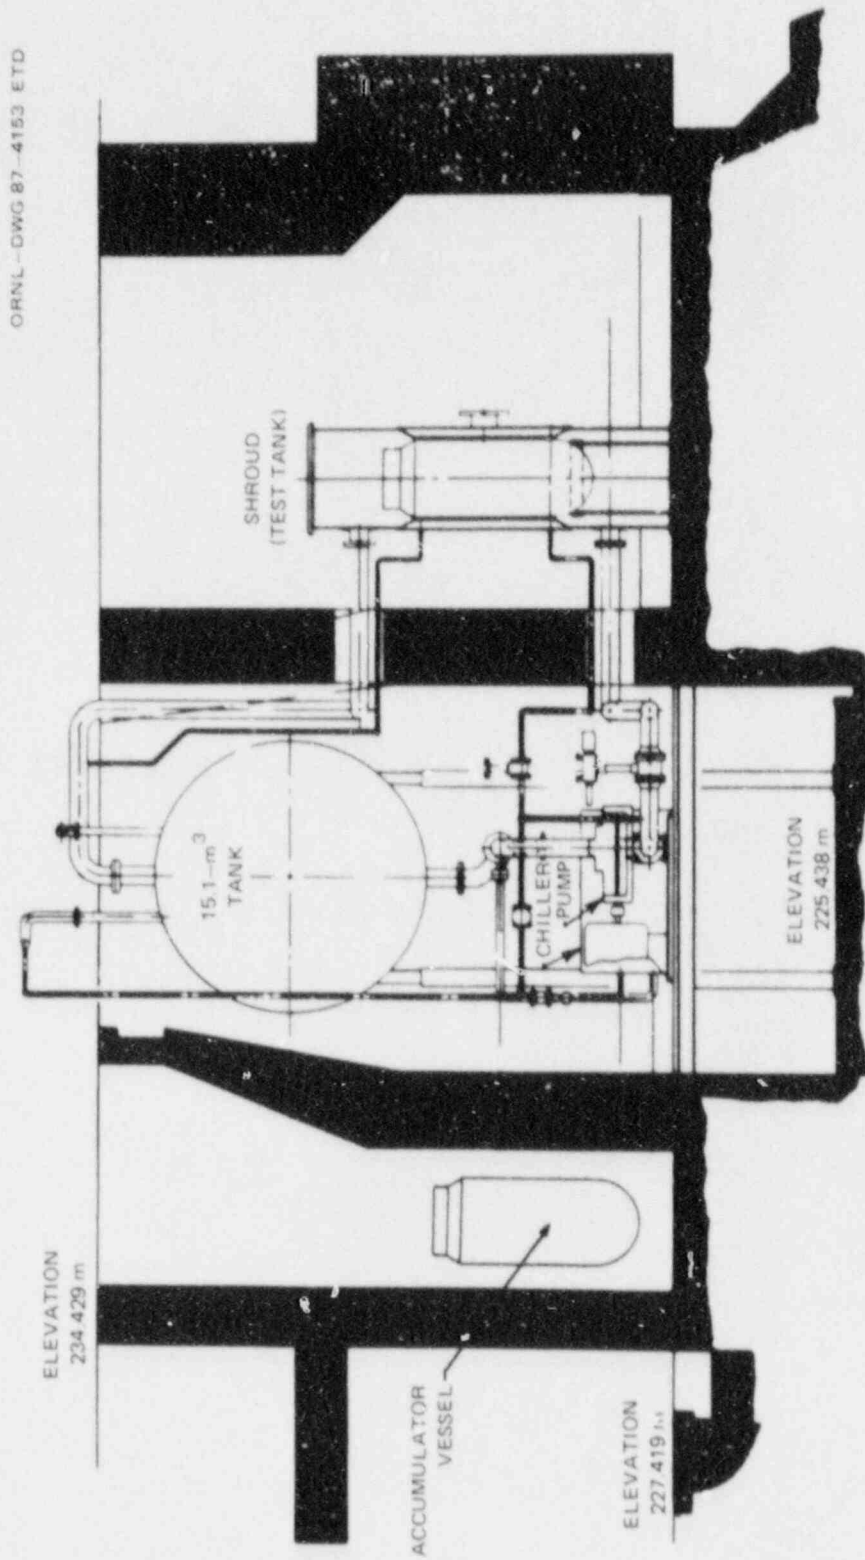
Section elevation of pressurized-thermal-shock test facility.
